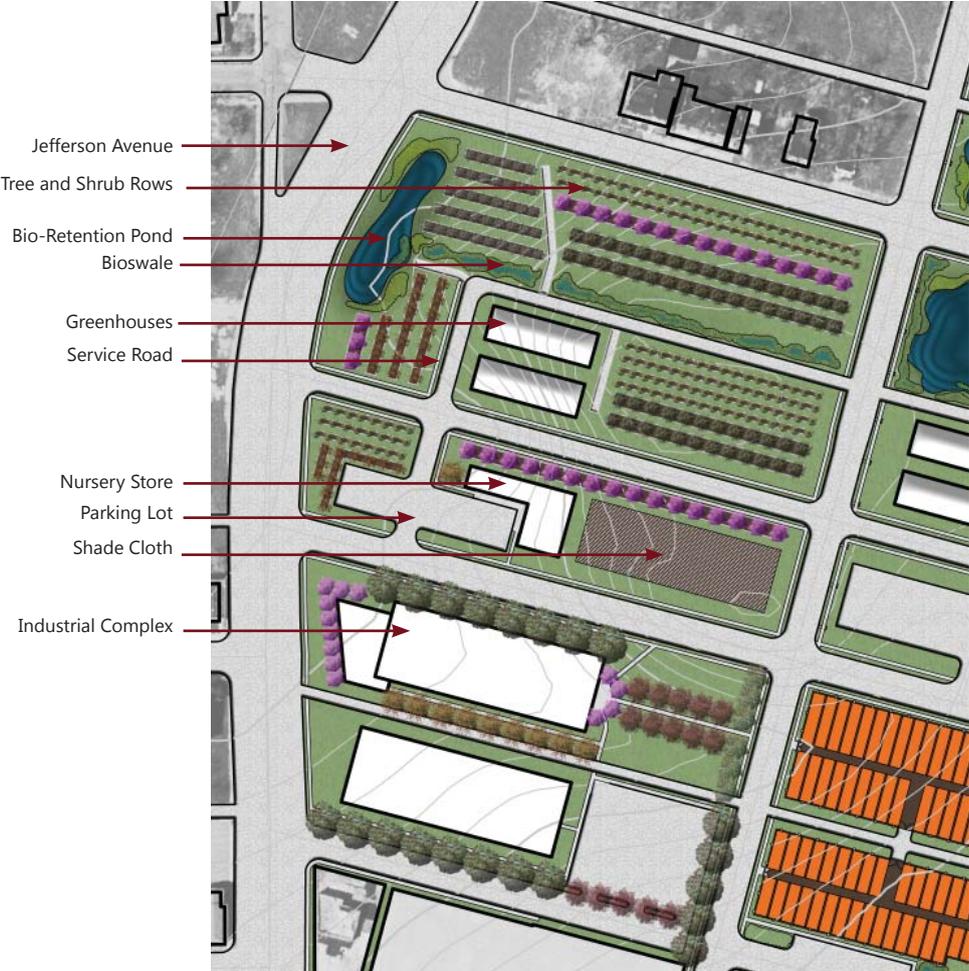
Native Plant Nursery Detail Plan. Produced by Author.
